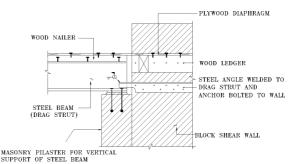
Typical detail for transfer of force from drag struts to a block shear wall
